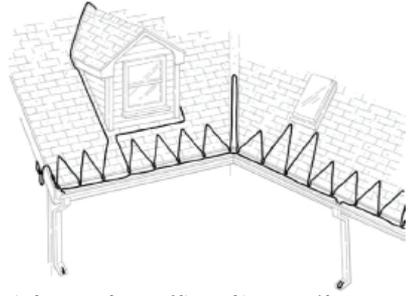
Typical pattern along roof line and in gutters/downspouts.
